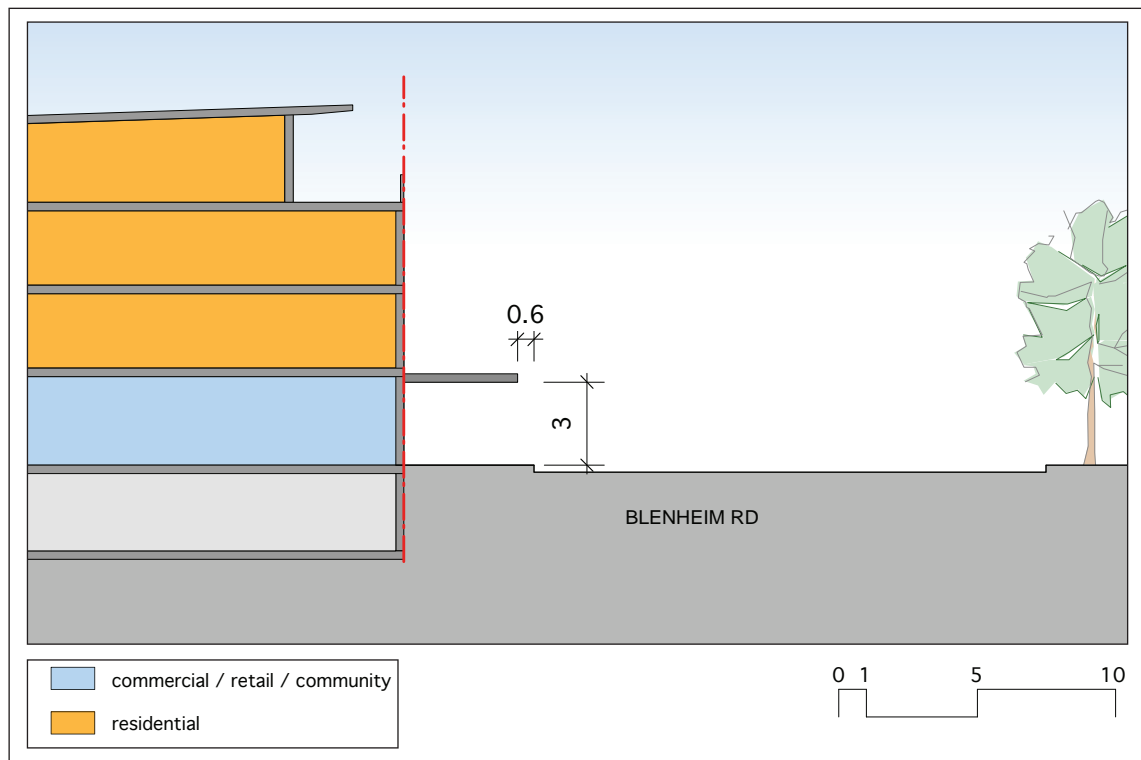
Blenheim Road Small Centre Awning Control Cross Section
